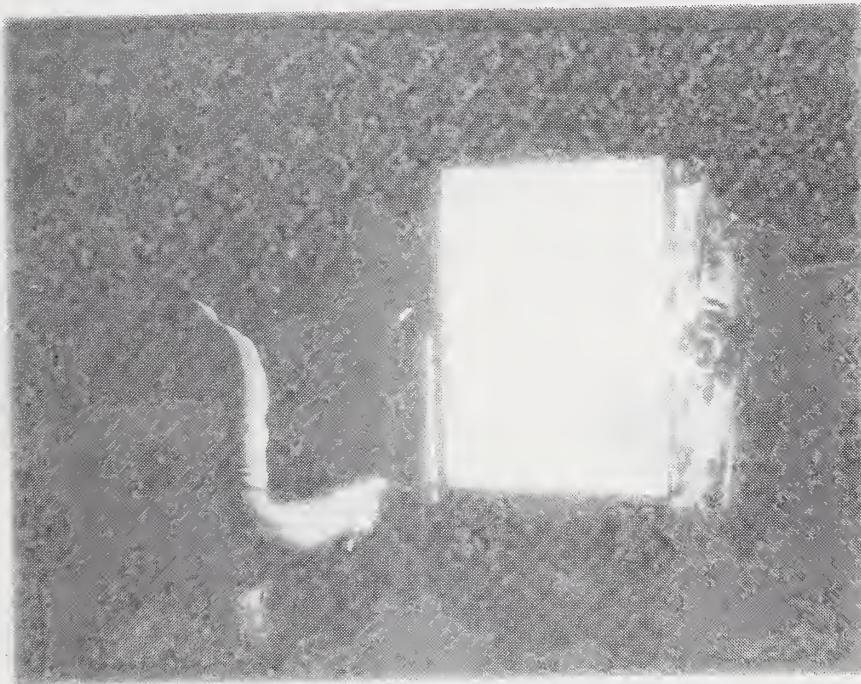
Space for Air Leakage (Shows Light) Between Window and Wall Framing
